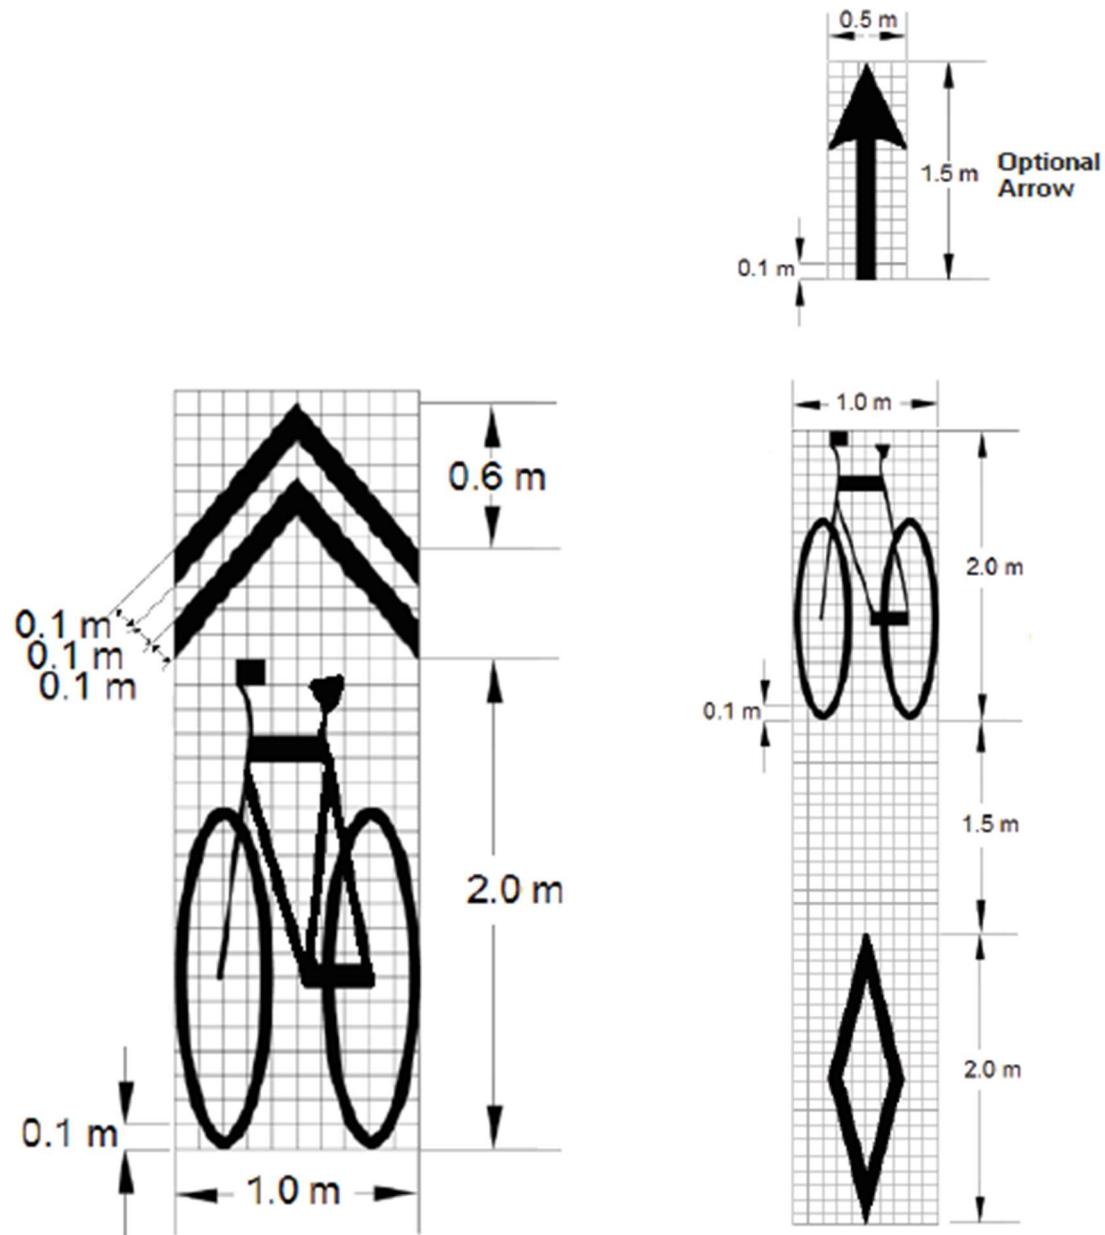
Pavement Marking for Cycling Facilities (Ministry of Transportation, 2000)
